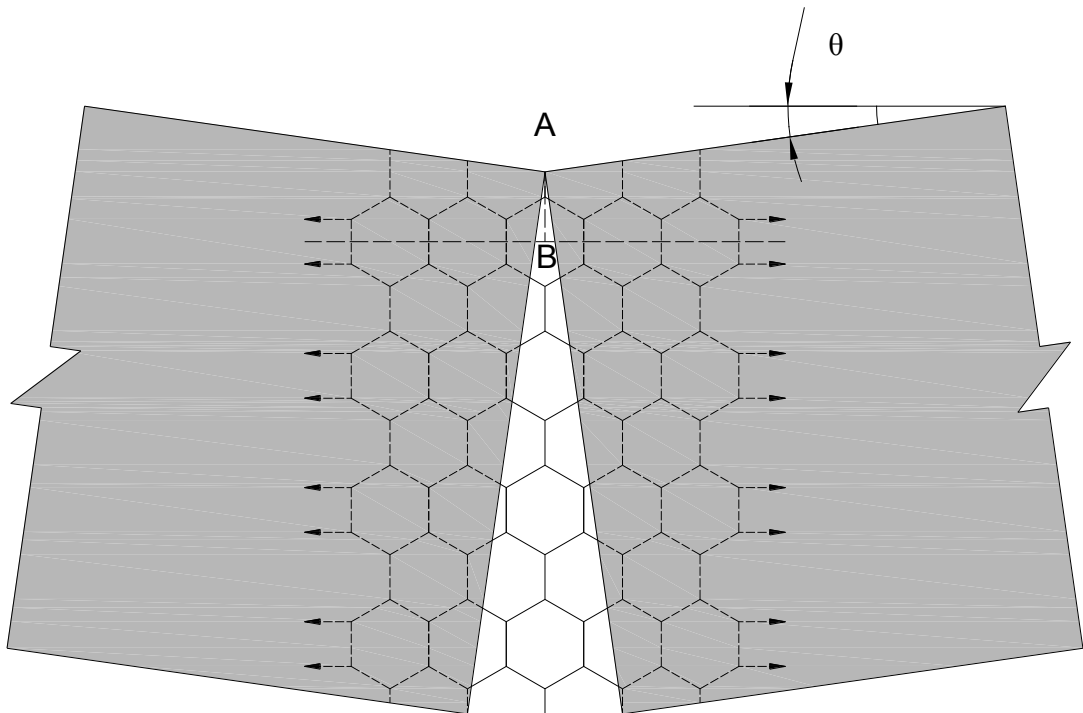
A portion of a wall near the cracked section (Plan View)
